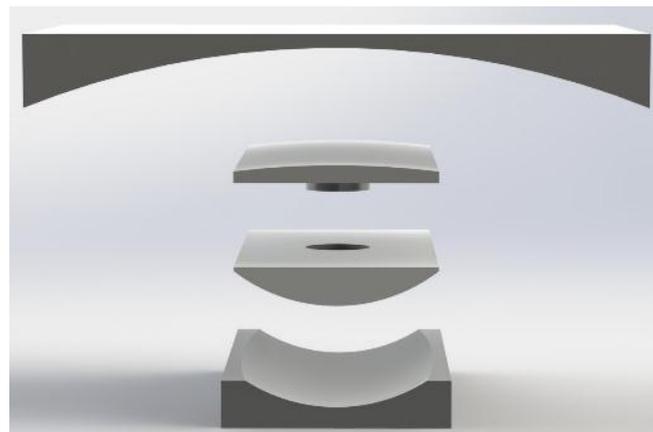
Representation (exploded view) of designed pendulum bearing – with the central two-part calotte having cylindrically shaped upper and lower sliding surfaces.
